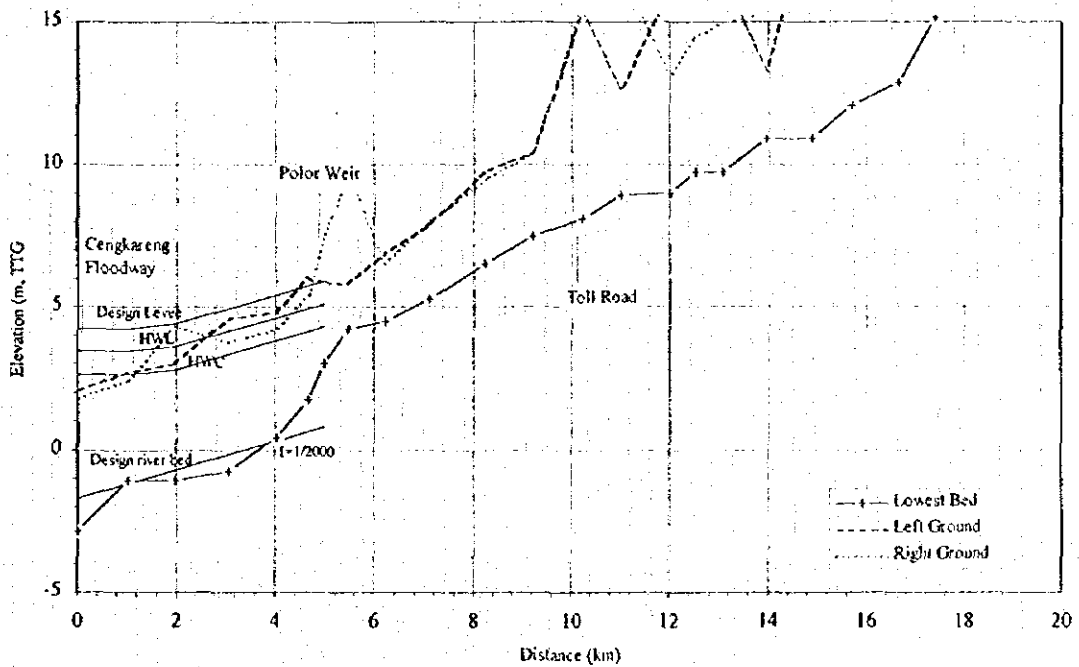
PROPOSED LONGITUDINAL PROFILE AND CROSS SECTION (6/13)
